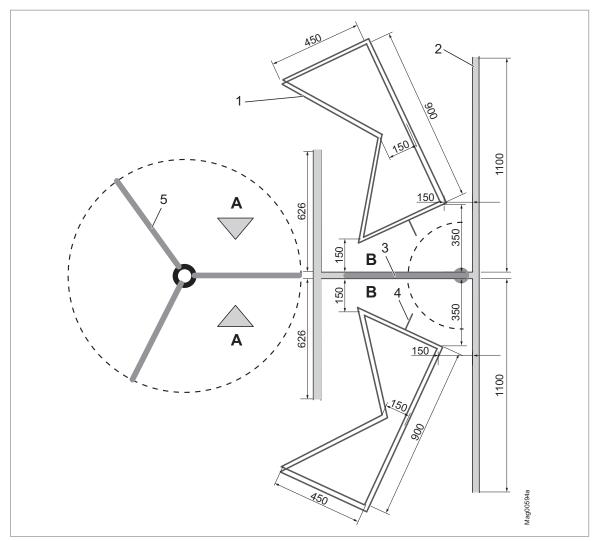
Location plan of induction loops for bicycle access (dimensions in mm)
